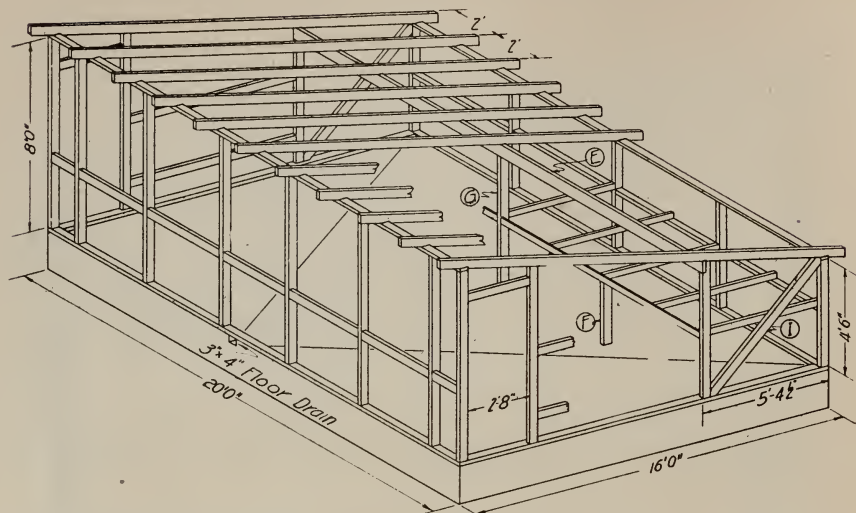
Framing detail of farm poultry house, *E*, 2 × 6 inch girder, support for rafters. *F*, 2 × 4 inch leg supporting front of droppings board. *G*, 2 × 4 inch post supporting front of droppings board and continuing up to support 2 × 6 inch girder. *I*, 2 × 4 inch end bracing.
